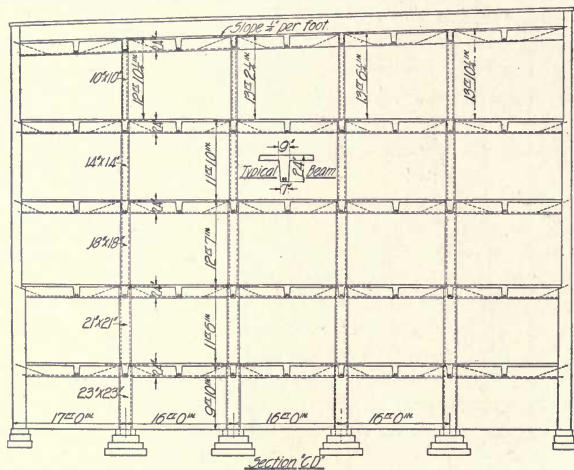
Cross-Section of Forbes Cold Storage Warehouse.
